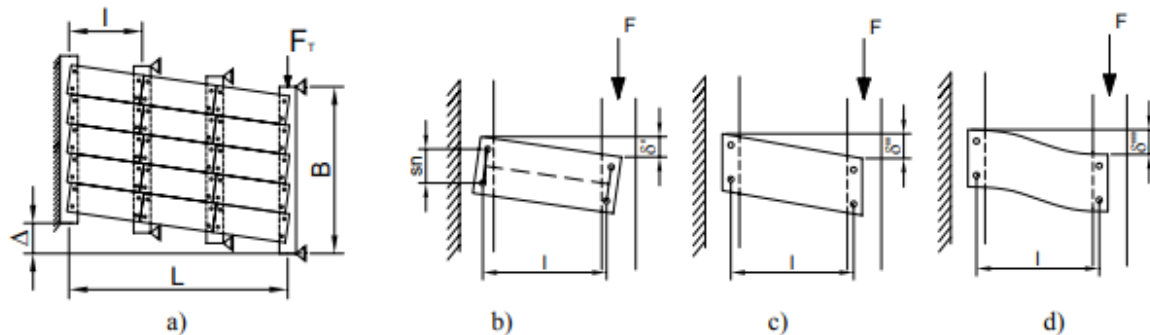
TIMBER BEAM-PLANK CONNECTION: B-RIGID DEFORMATION, C-SHEAR DEFORMATION AND D-FLEXURAL DEFORMATION. (A. BRIGNOLA & S. PODESTÀ, 2008)
